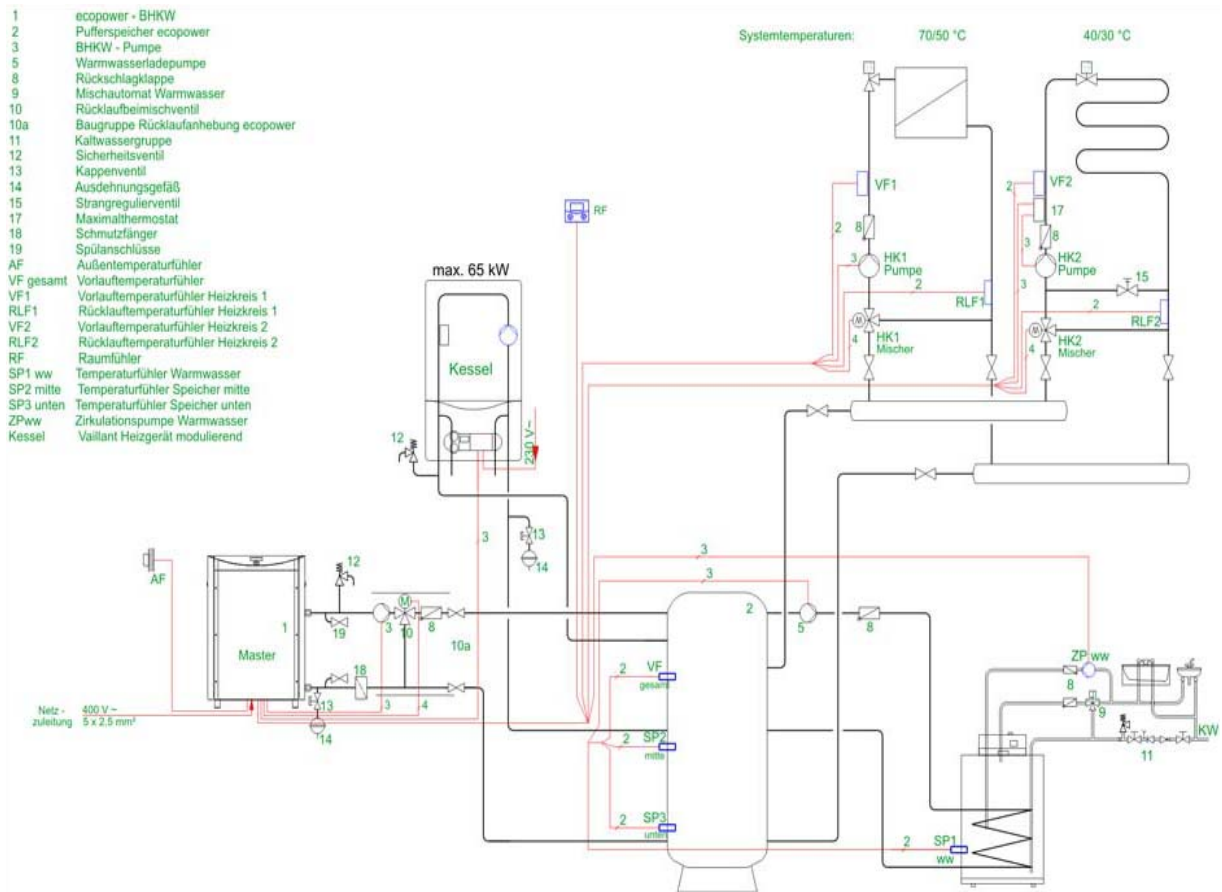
Hydraulic integration of the CHP-plant with peak load boiler and buffer storage at the test rig
